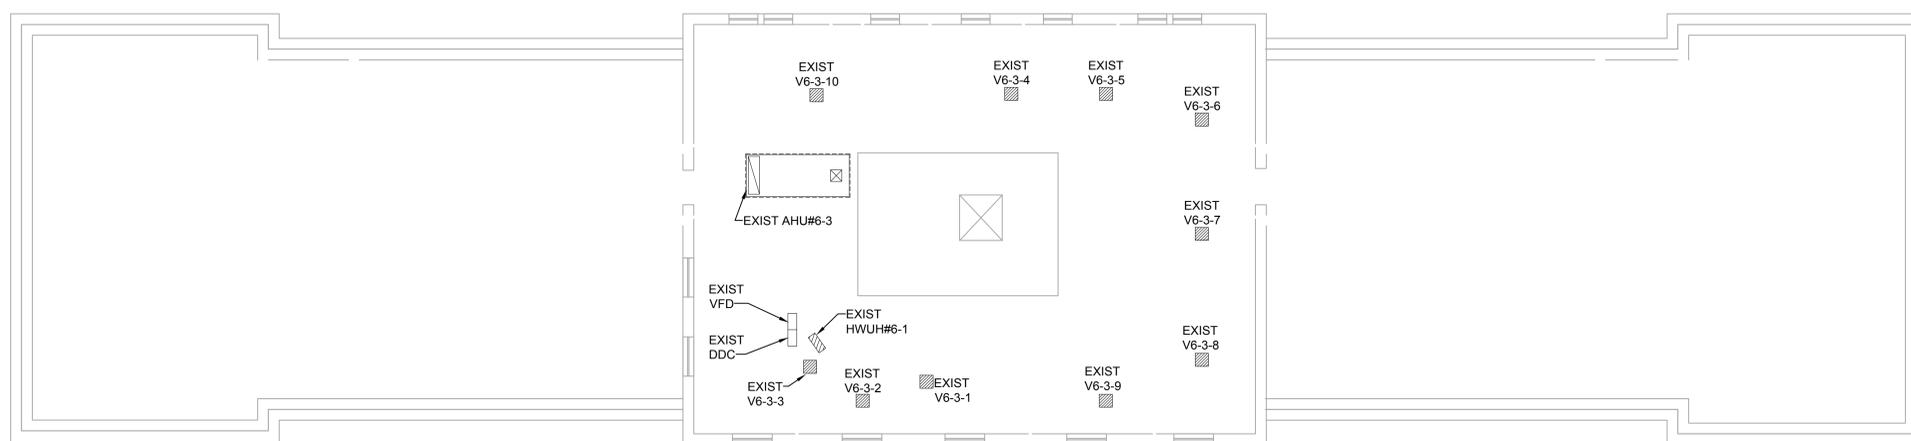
RD FLOOR PLAN - MECHANICAL
